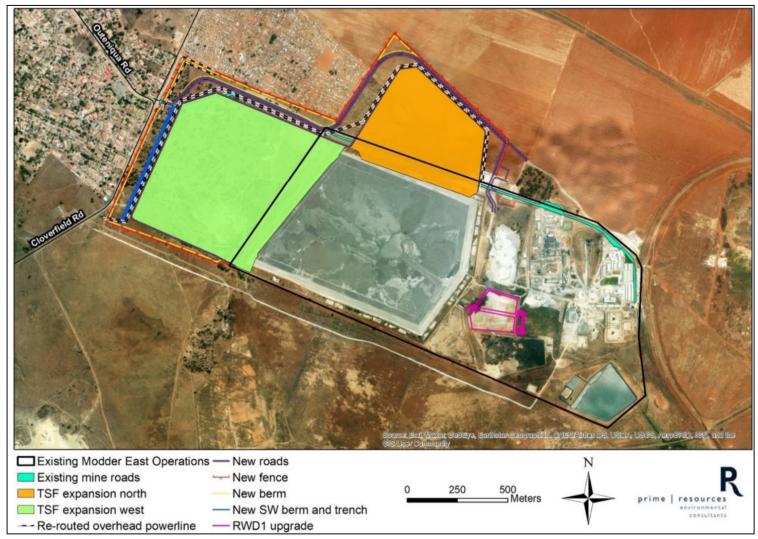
Site plan showing the existing infrastructure and position of the proposed TSF expansion
